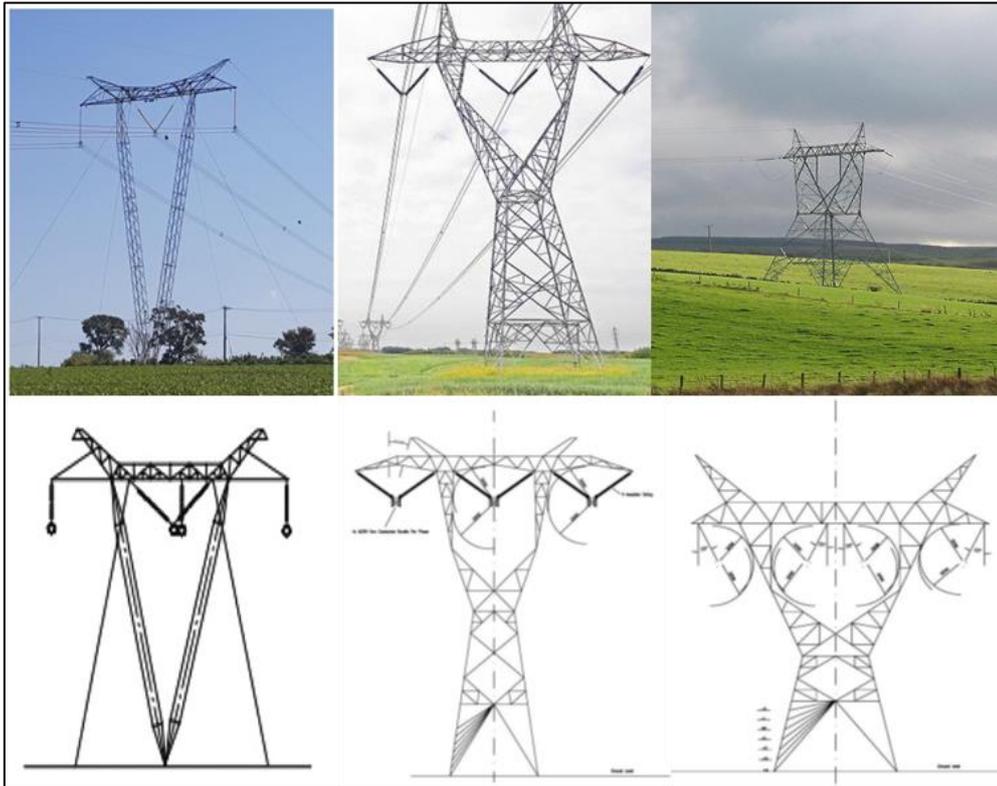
Typical of towers used on OHL projects (from left to right Suspension V tower - Self-supporting suspension tower - Self-supporting Y tower)
